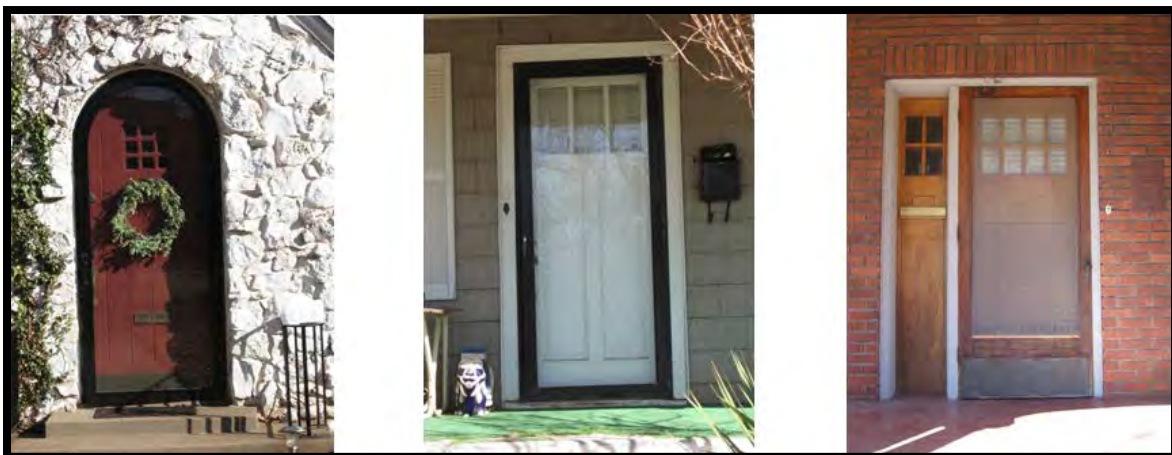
A STORM DOOR ADDED ON FRONT FAÇADES SHOULD BE A FULL-VIEW DESIGN AND FIT THE DOOR OPENING.
